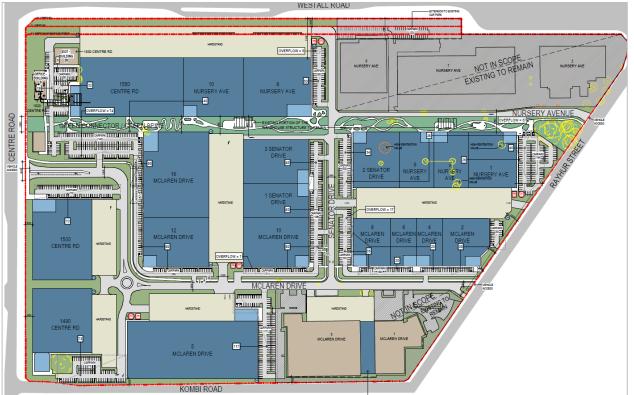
Proposed Industrial Estate Site Plan (North to the Left of the Plan)
